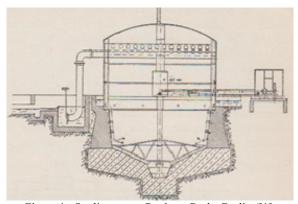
Settling tower Röckner-Rothe Berlin ([1], p.p. 683)
